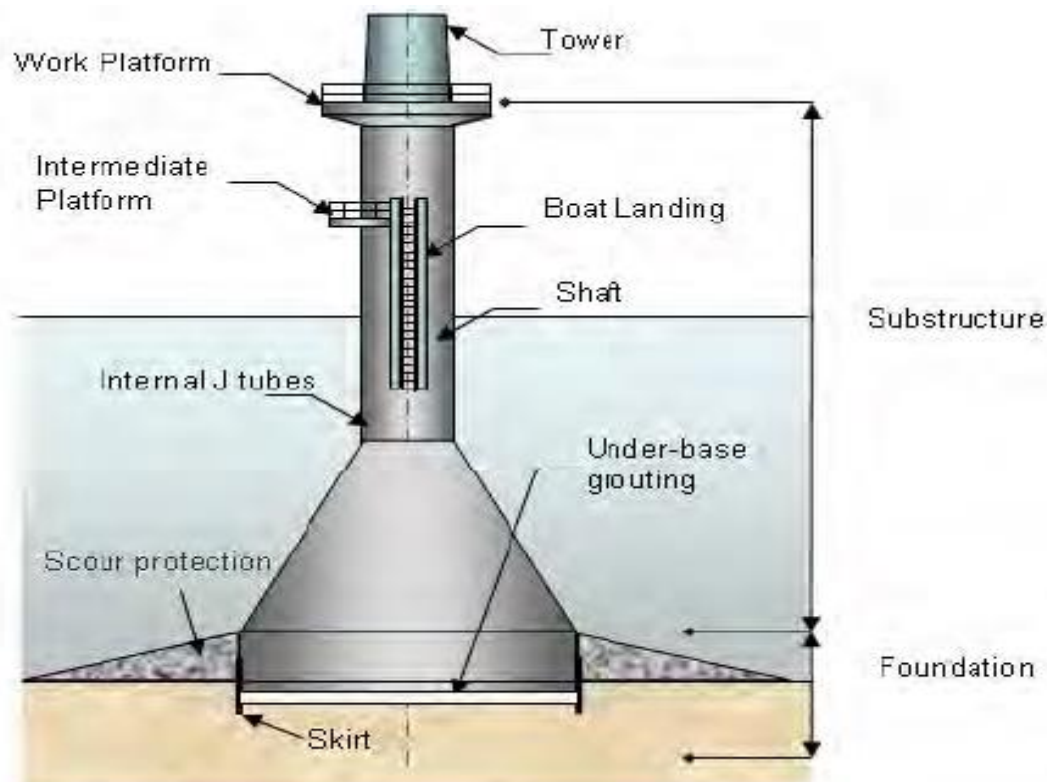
Components of a Gravity Foundation (EWEA, 2009)
